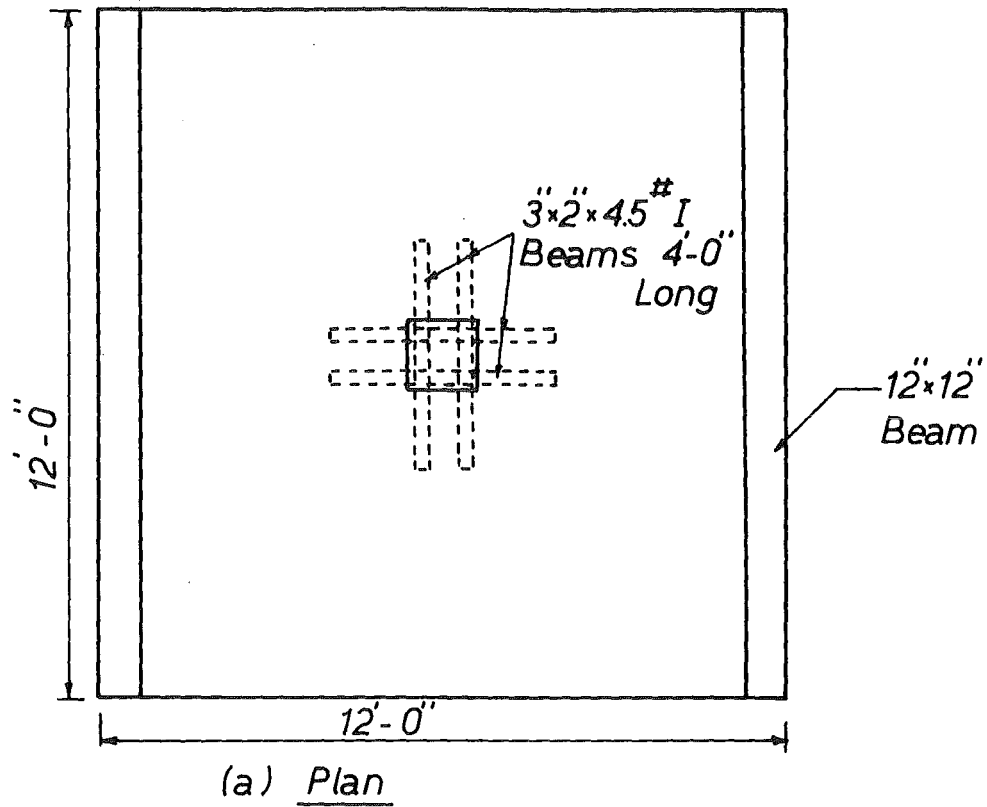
DETAILS OF HOLLINGS' TEST STRUCTURE
